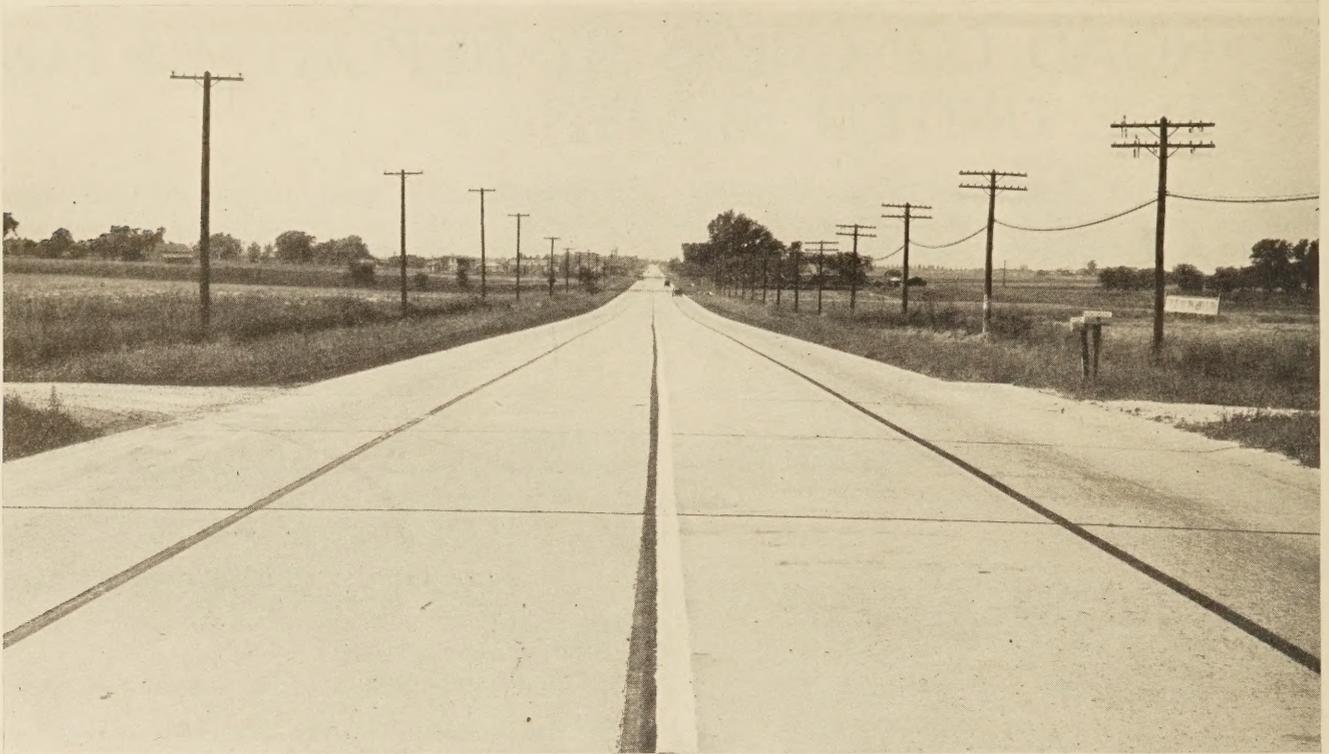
TYPICAL 4-LANE CONCRETE PAVEMENT.
